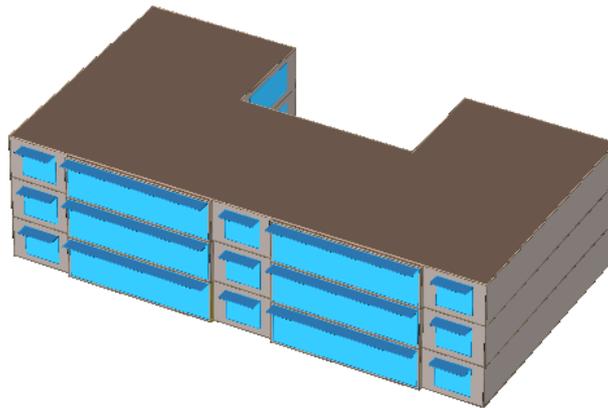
Trombe walls and the overhangs on the south façade of the building in the eQuest model
